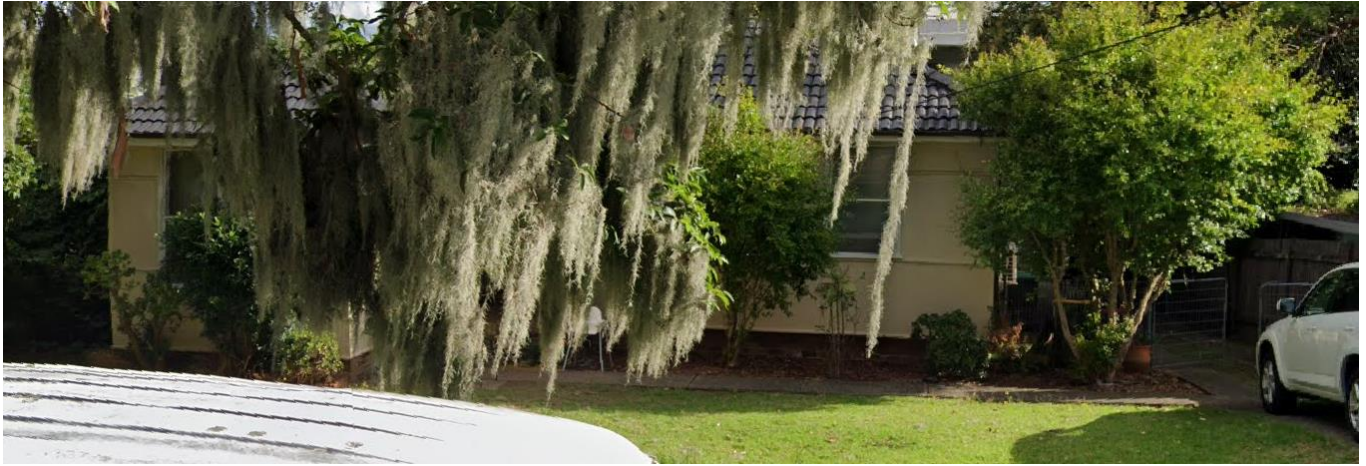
Development site – 6 Gover Street, Peakhurst (Source – Google Maps, Jan 2023)
